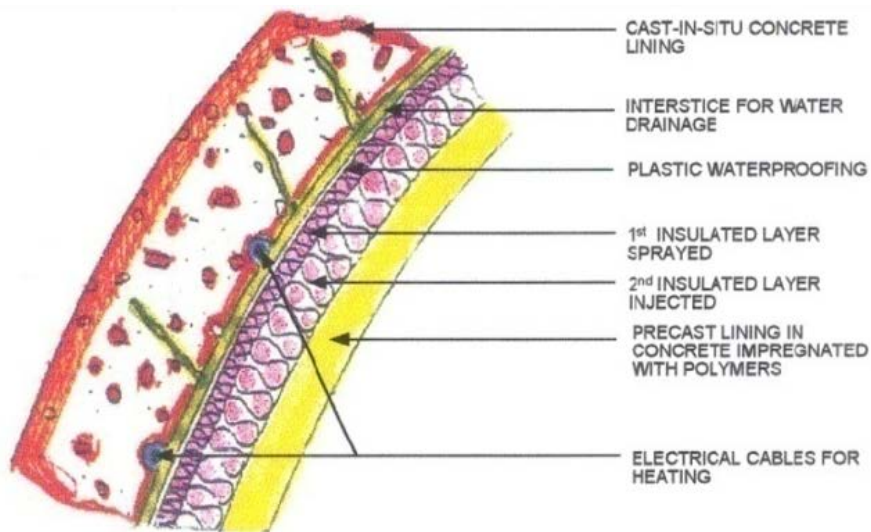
Leakage control on the interior face of an existing concrete tunnel using a space for water drainage, electrical heating cables, plastic waterproofing, sprayed insulating layer, and an interior precast liner (Russell, 2001).
